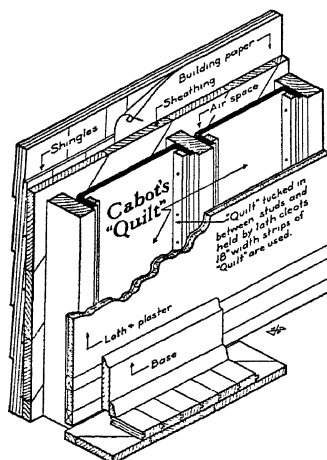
Isometric View of Frame Wall Showing Application of Quilt Type Insulation
